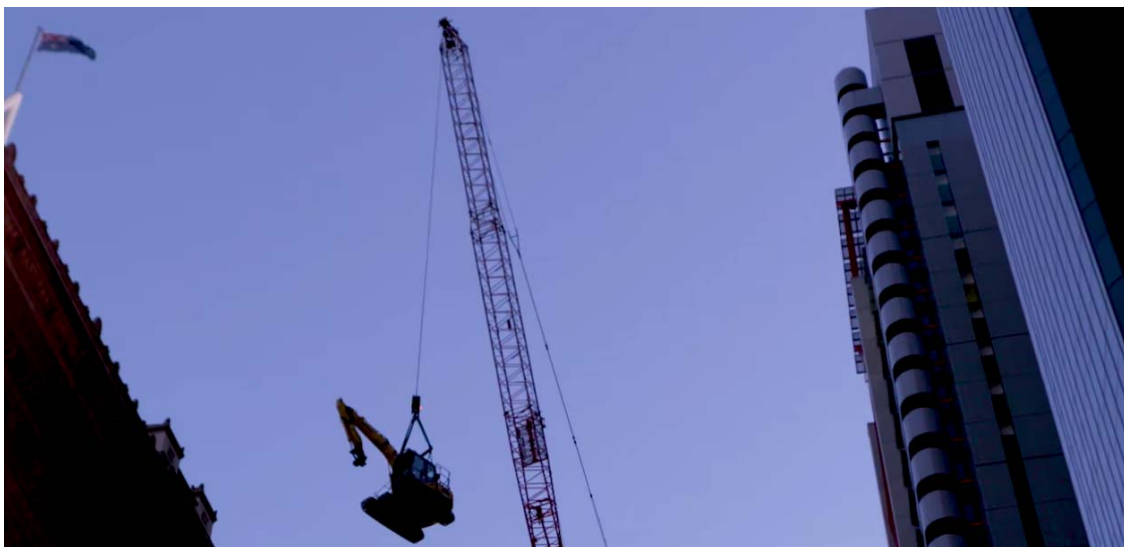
An Excavator being Craned onto a High-Rise Rooftop at the Martin Place Station Site
